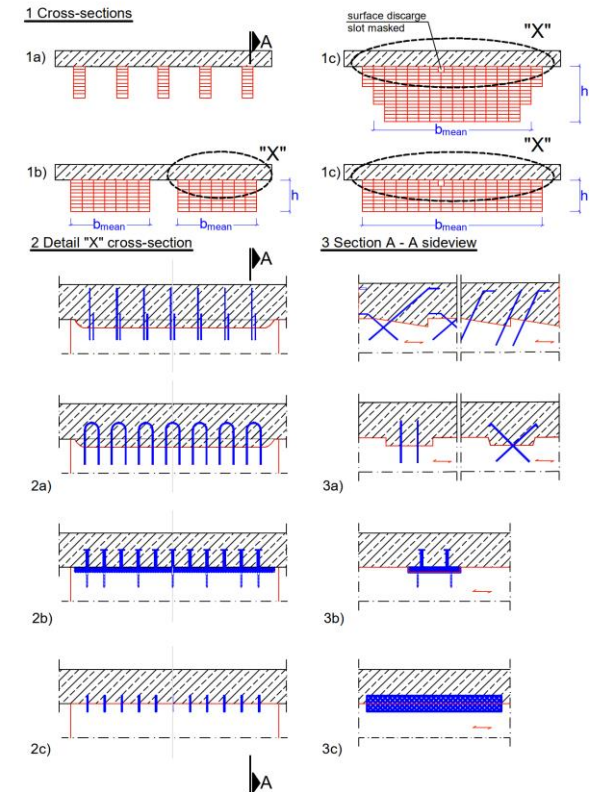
Examples TCC-bridge types with mainly used connections
